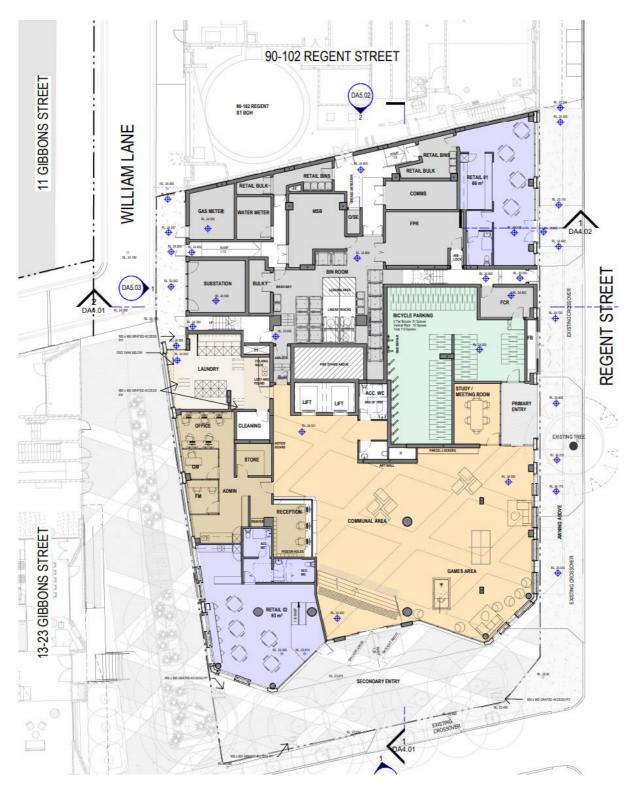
| Ground floor plan (Source: Applicant's RRtS)
